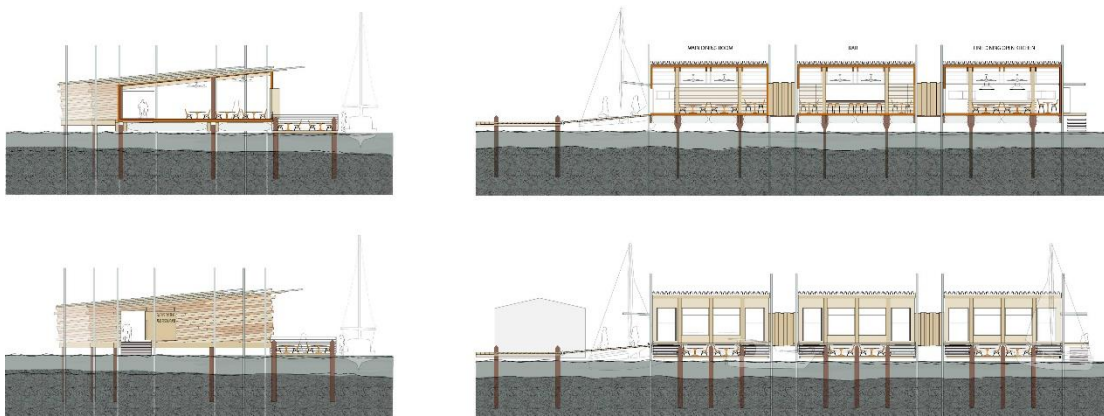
Bar Crassostrea: Sections and Elevations – Image by Author
